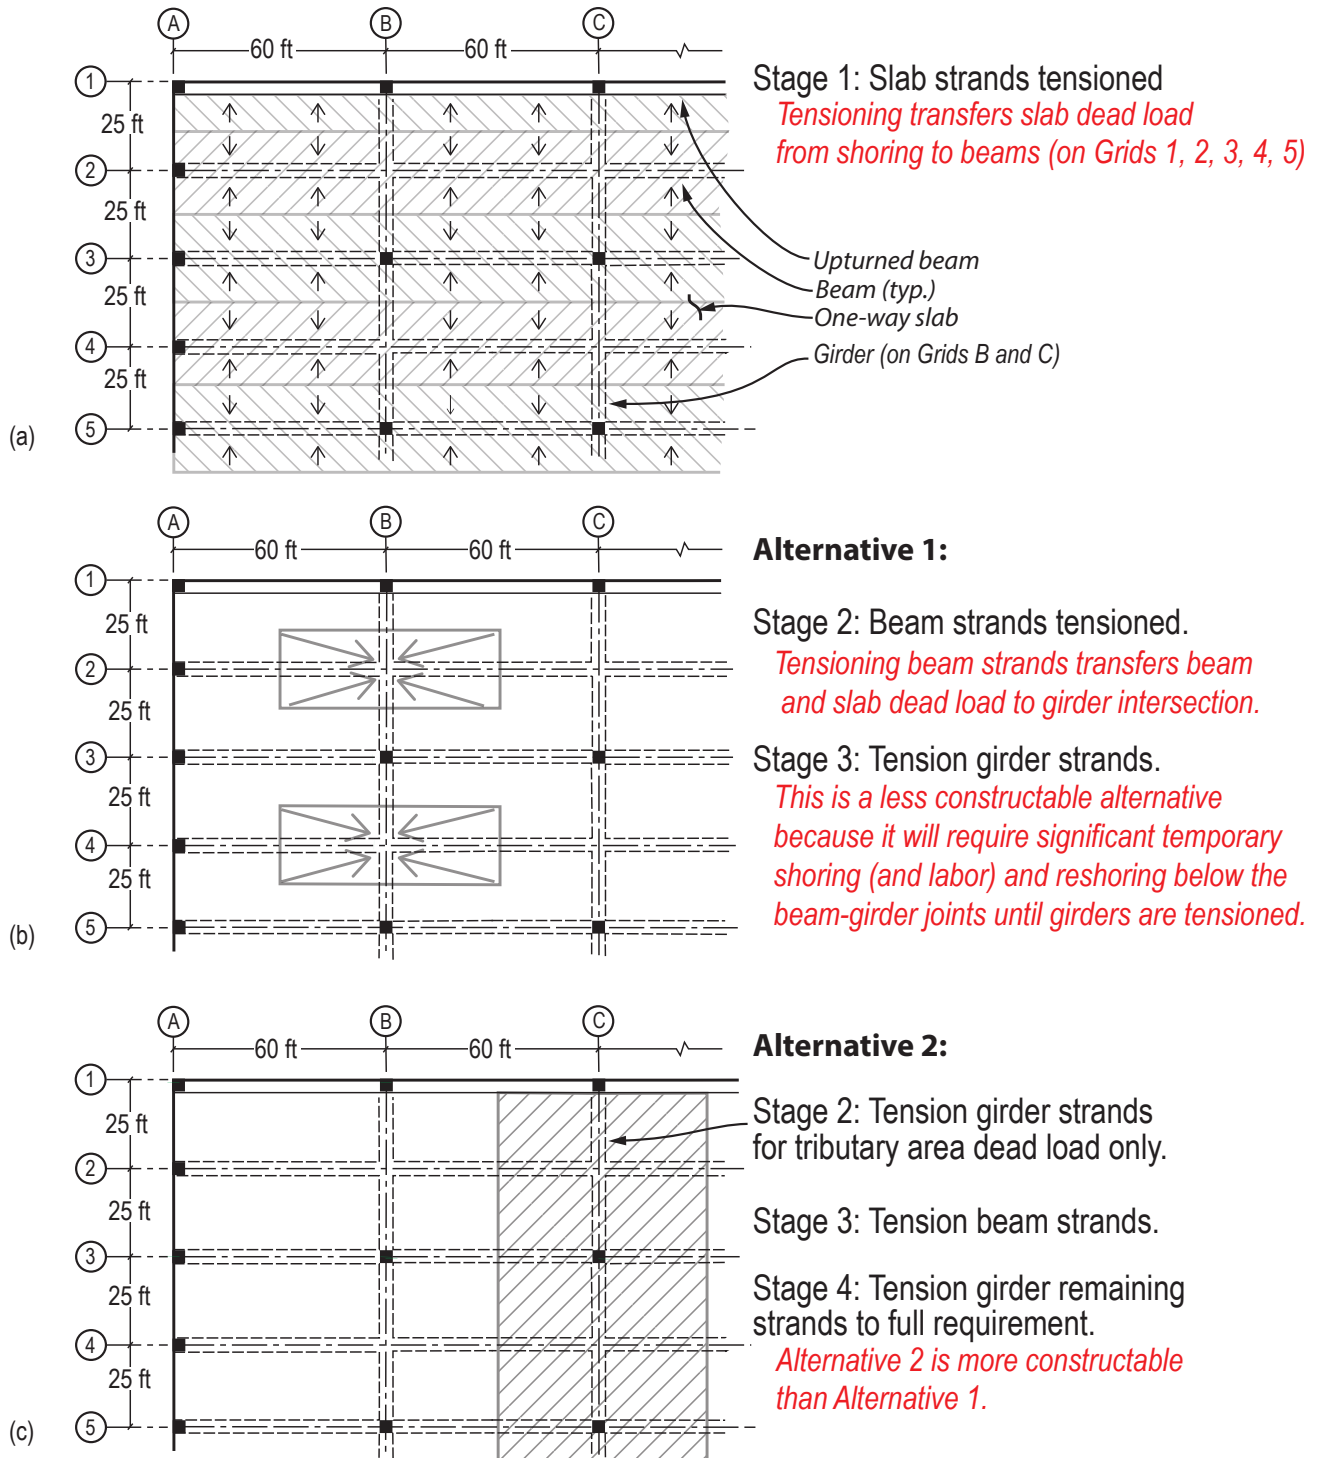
An example of stage post-tensioning: (a) Stage 1, tensioning of strands in the slab will unload the shores under the slab and add to the shoring loads under the beams; (b) if beam strands are tensioned in Stage 2, the slab and beam loads will be transferred to supporting girders, thus adding significantly to the shoring loads at the intersections of beams and girders; and (c) if instead the girder strands are tensioned in Stage 2, the high local shoring loads at the beam intersections can be avoided. For additional information, refer to “Reshoring and Early-Age Building Behavior,” an on-demand course available through ACI University.
